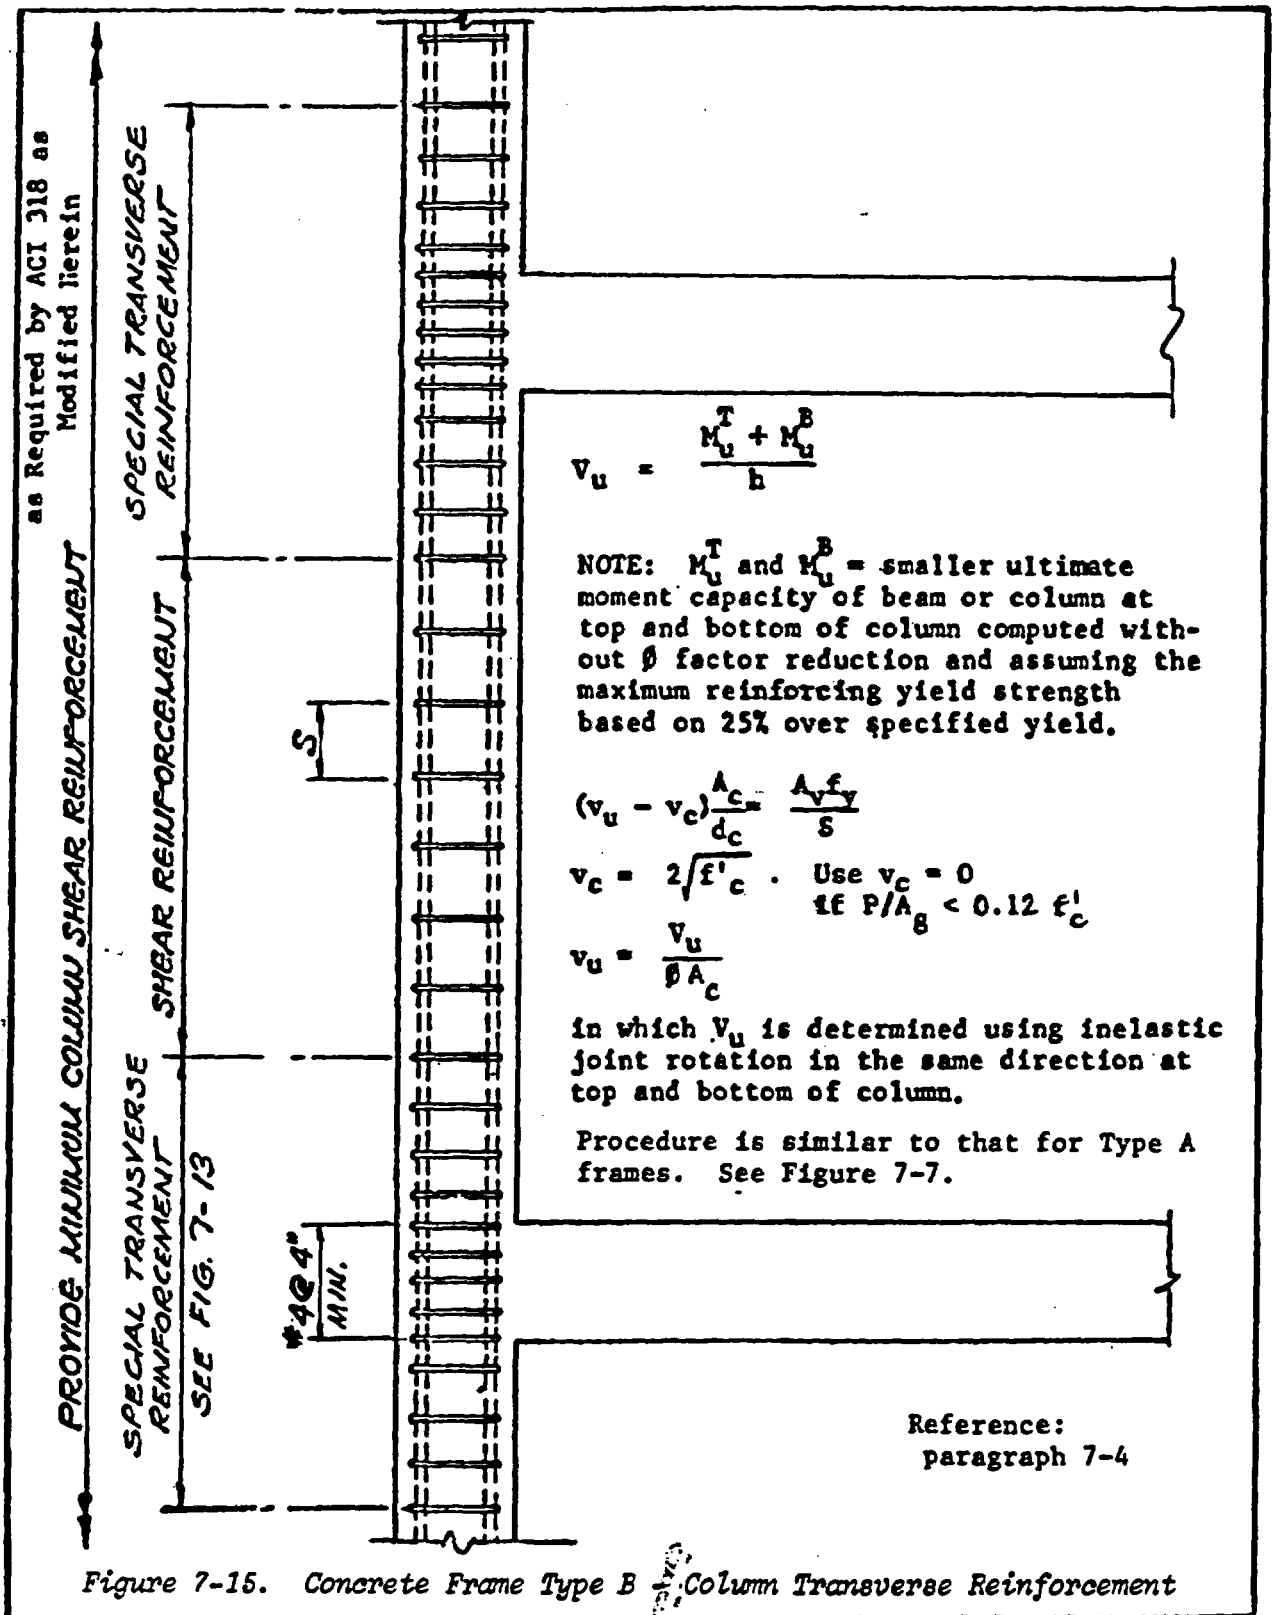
Concrete Frame Type B Column Transverse Reinforcement
